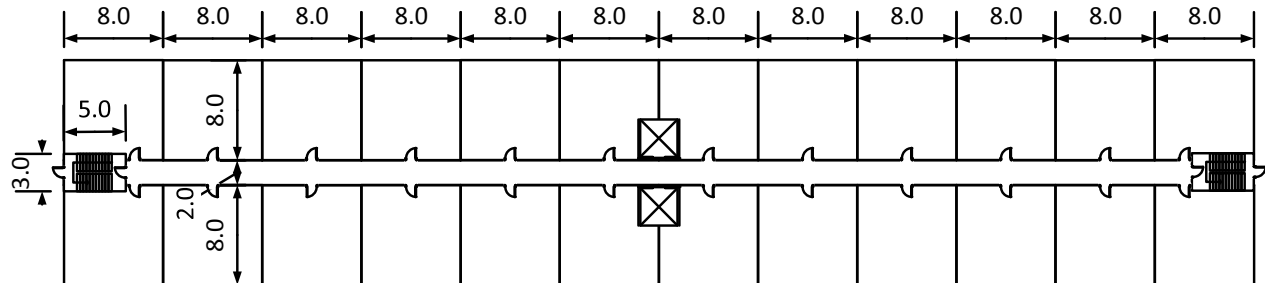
Layout of the large-area (1,728 m²) residential buildings
